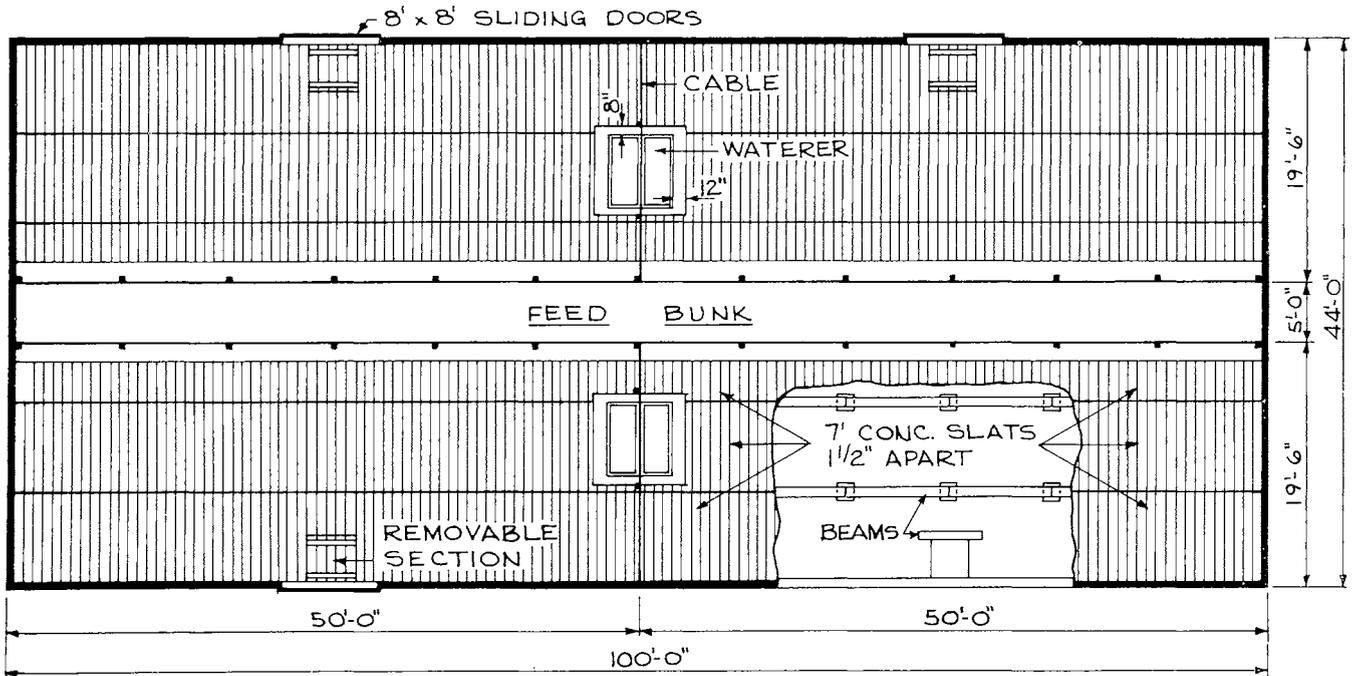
Plan view of the floor above the pit in a warm slatted floor building.
